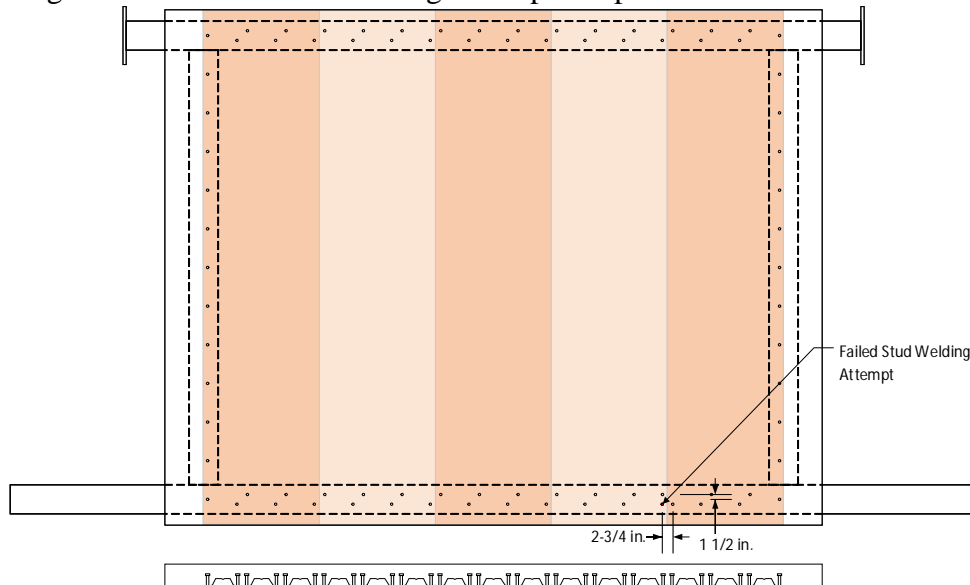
Location of Failed Stud Welding Attempt in Specimen 3/6.25-4-L-NF-DT
